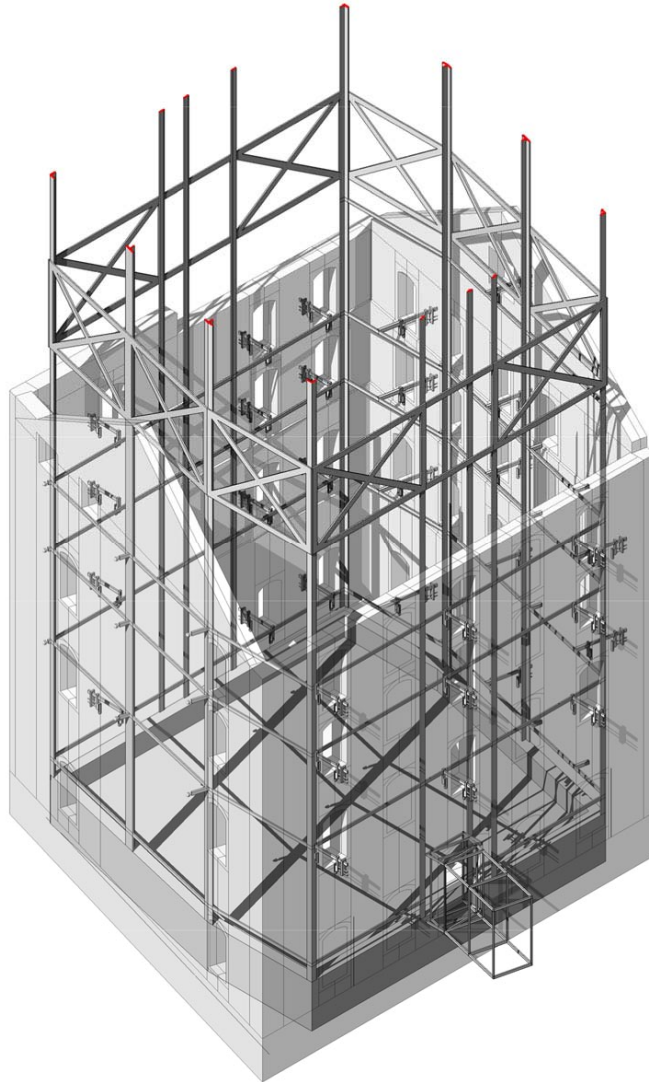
Primary scaffolding utilizes a belt frame. Extensions from the main structure stabilize the building shell at strategic point on the walls.
